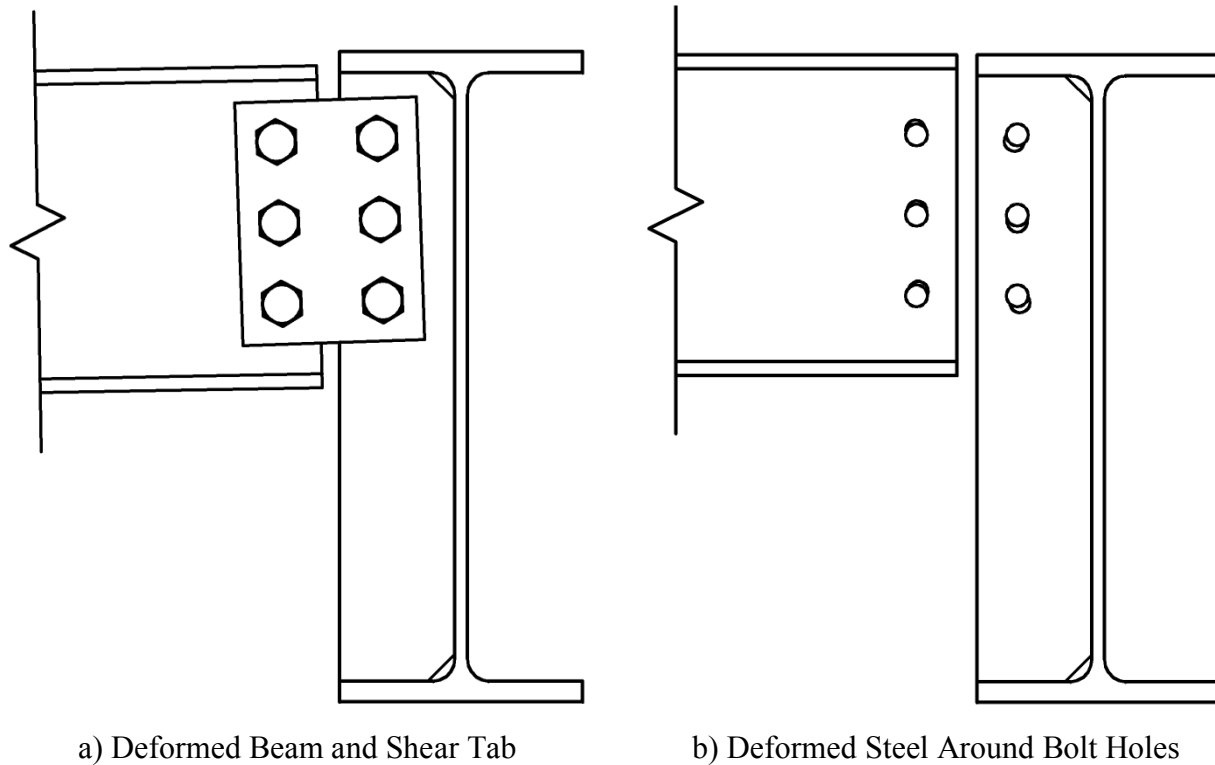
Bolt Bearing Failure, Configuration 8
